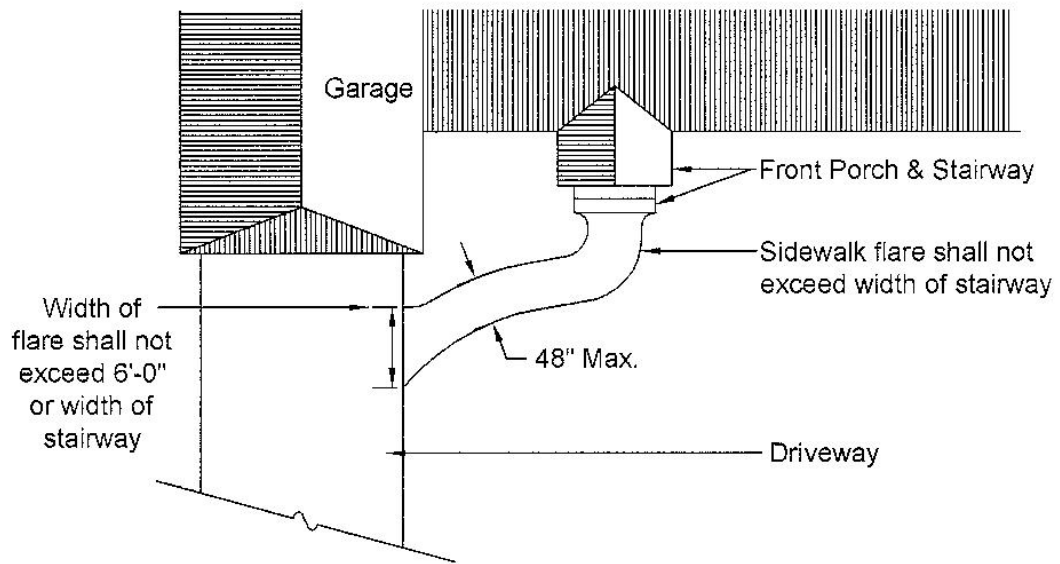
Curved Sidewalk/ Walkway Standard (Not to Scale)
